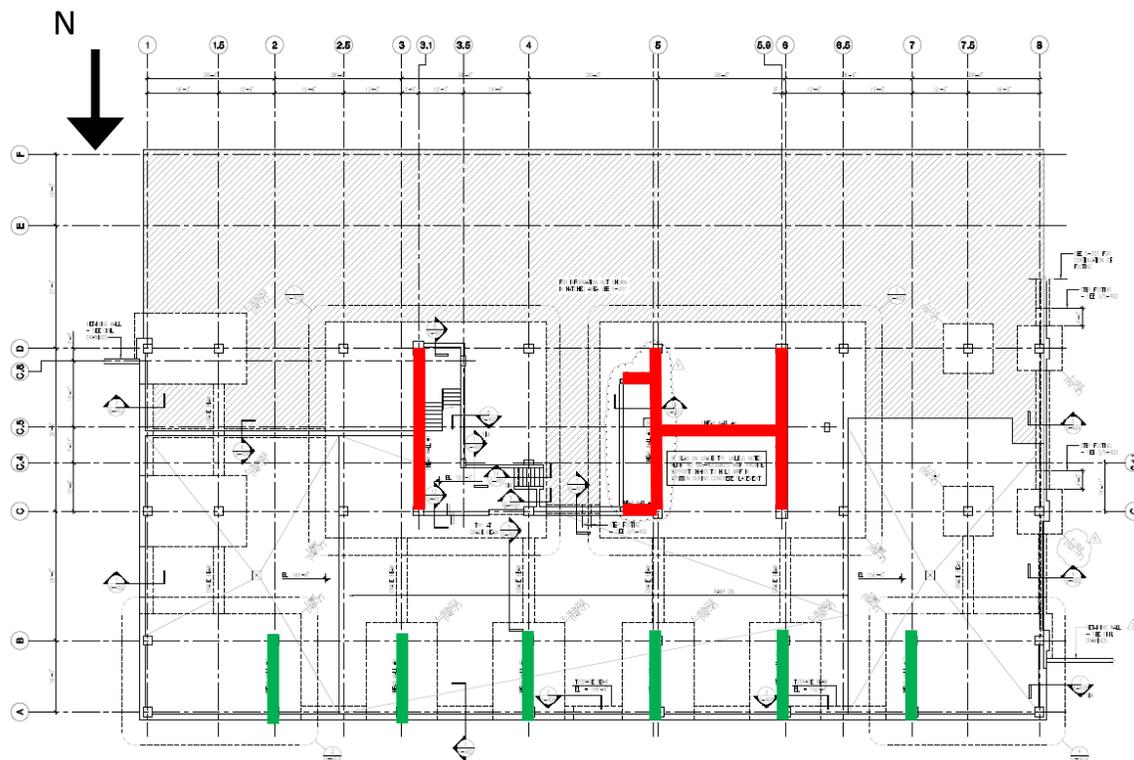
Foundation Plan (Level P0) Showing Shear Walls (Source: Cagley & Assoc. Drawing S-200)
